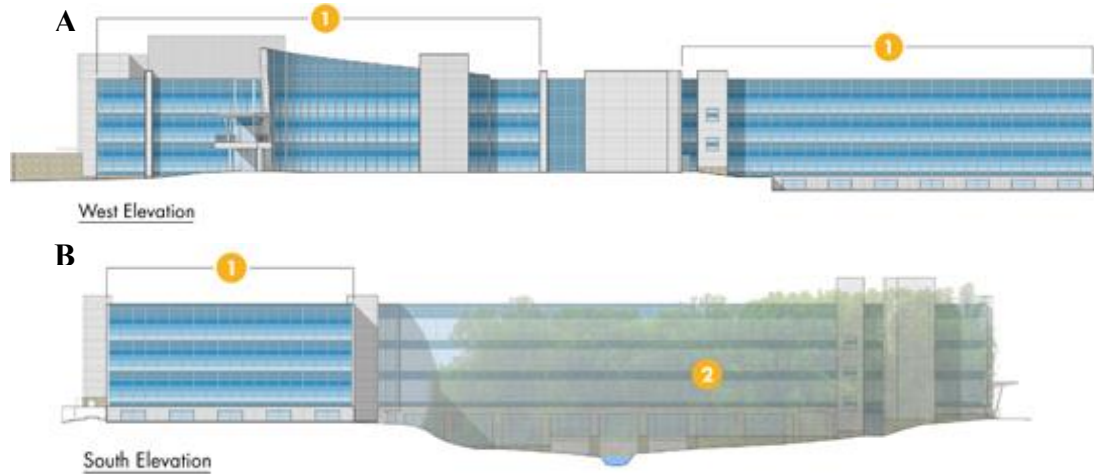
Saint-Gobain and CertainTeed facades:(A)The west facade and (B) south façade [36].
